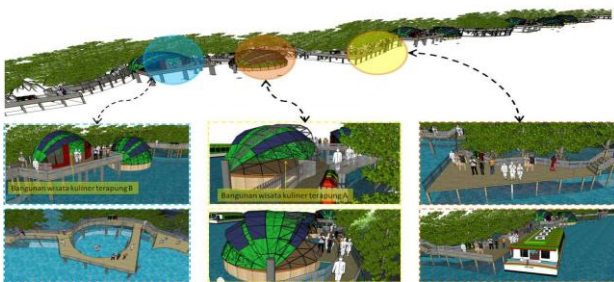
(top) Building with a tread; (left bottom) the stage building; (center bottom) floating structures; (right bottom) pier.
